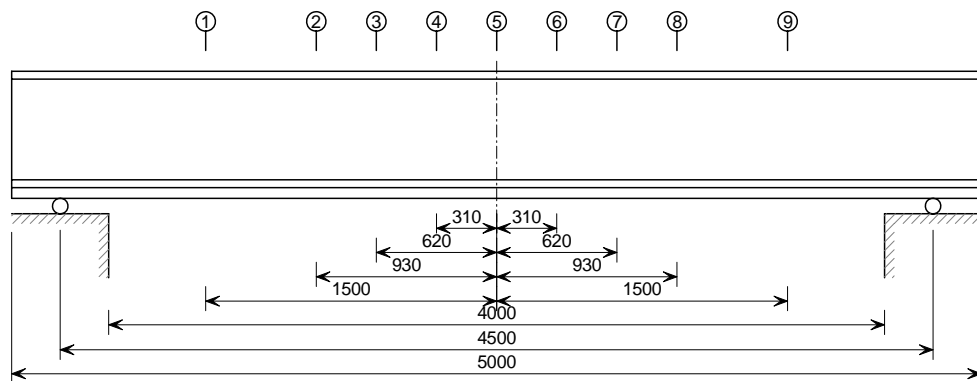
Longitudinal arrangement – Position of thermocouple cross sections
